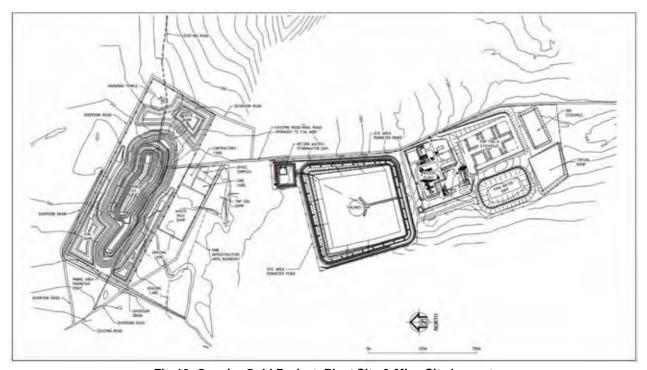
Ganajur Gold Project- Plant Site & Mine Site Lay out
